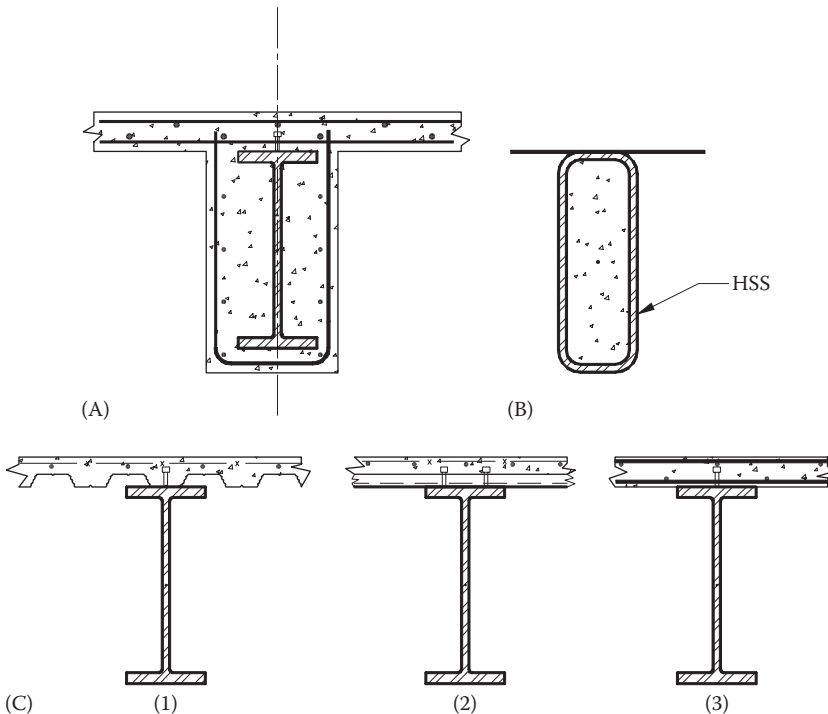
Three types of composite beams addressed in the AISC manual: (A) fully encased steel beam; (B) concrete filled HSS; (C) steel beams with mechanical anchorage to slab. (1) Steel deck parallel to beam; (2) steel deck perpendicular to beam; (3) cast-in-place slab without steel deck.
